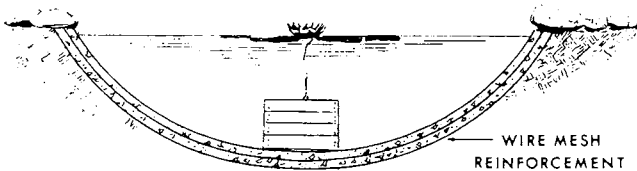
Top of the planting box for a water lily should be 12 to 18 inches below the water surface.
